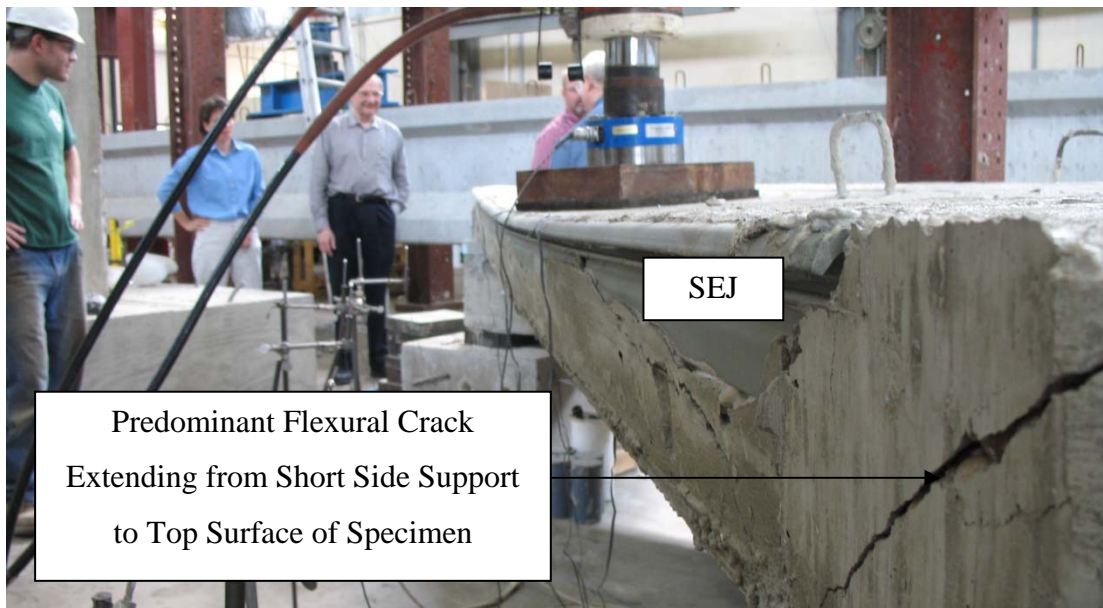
Predominant Cracks at Southwest Corner of Specimen at Conclusion of Static Test to Failure of Specimen P45P3
